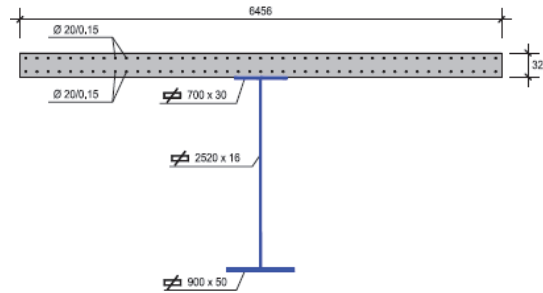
Plated steel section in New Sado Bridge Crossing (approaching viaduct)
